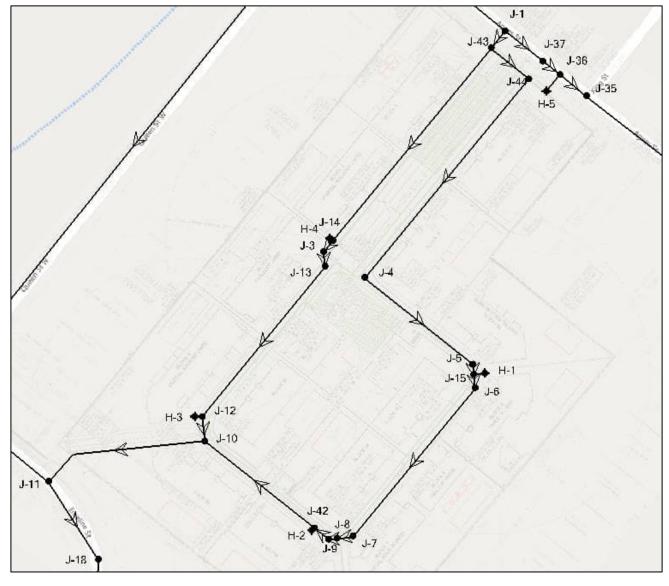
Agnes St Subdivision (Close-Up) Layout with Junction and Hydrant IDs
